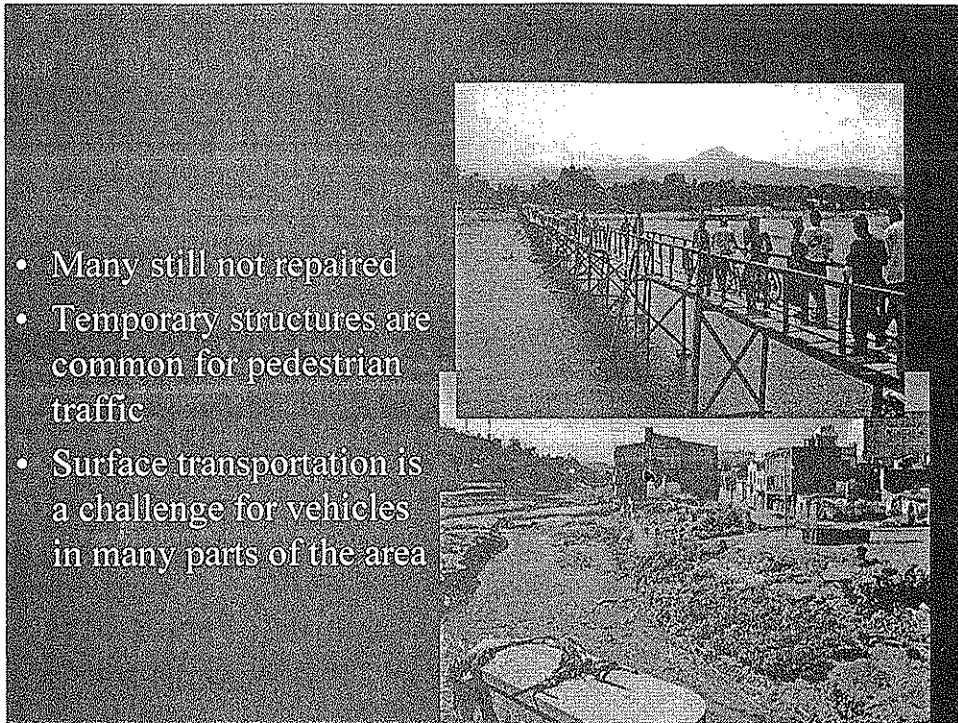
Temporary foot bridges and Damaged Bridge Infrastructure
